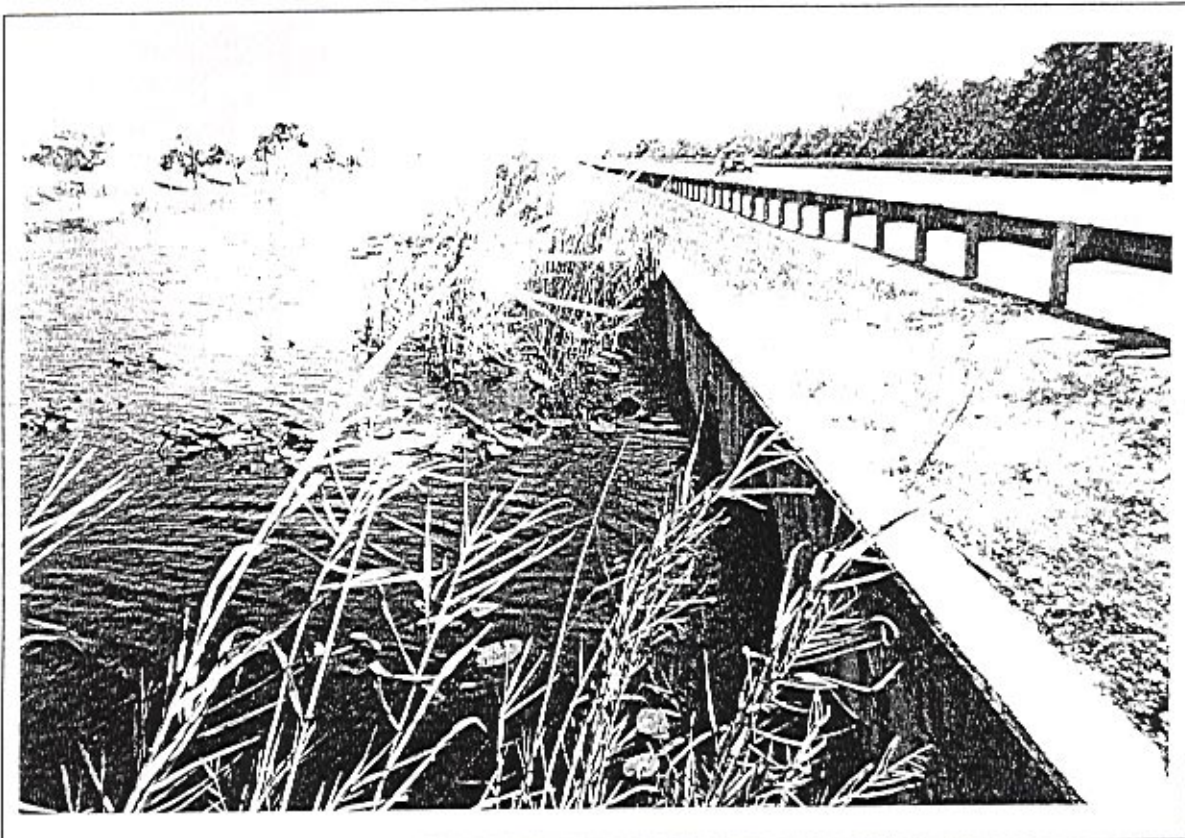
Example of northern culvert openings 1/2 full of water, with moderate to rapid flow, and sparse vegetation.
